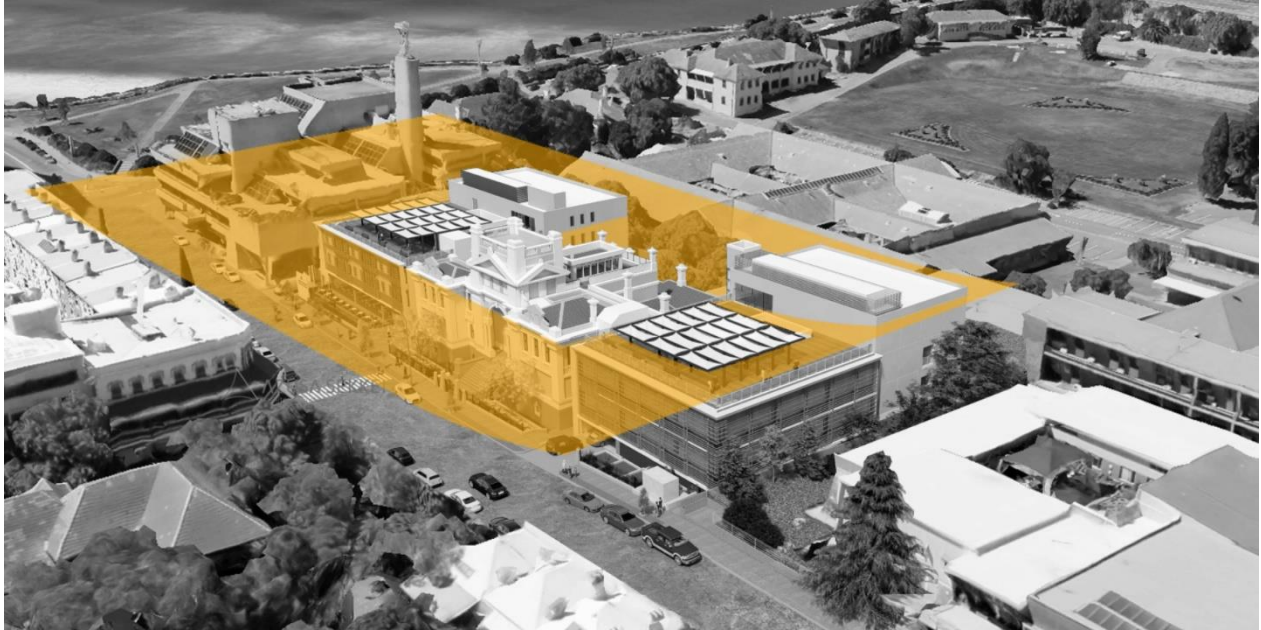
3D view of proposed development showing 10m height plane in yellow shading (Source: Azusa Sekkei)
